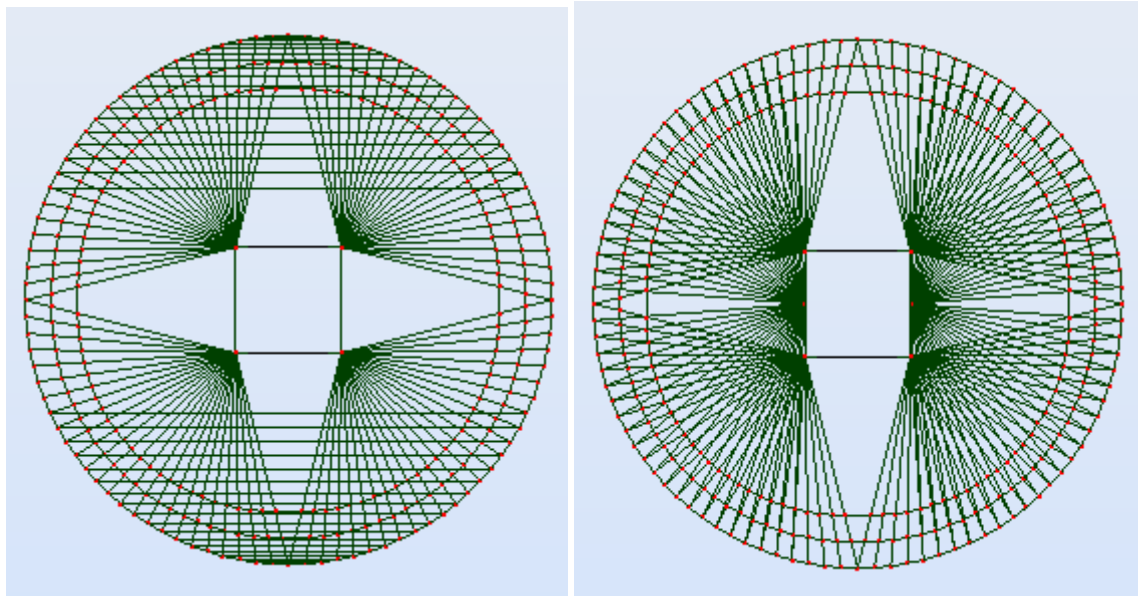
Cross-sections of the 100 by 100 foot models with top & bottom bracing (left) and center deck bracing (right).
